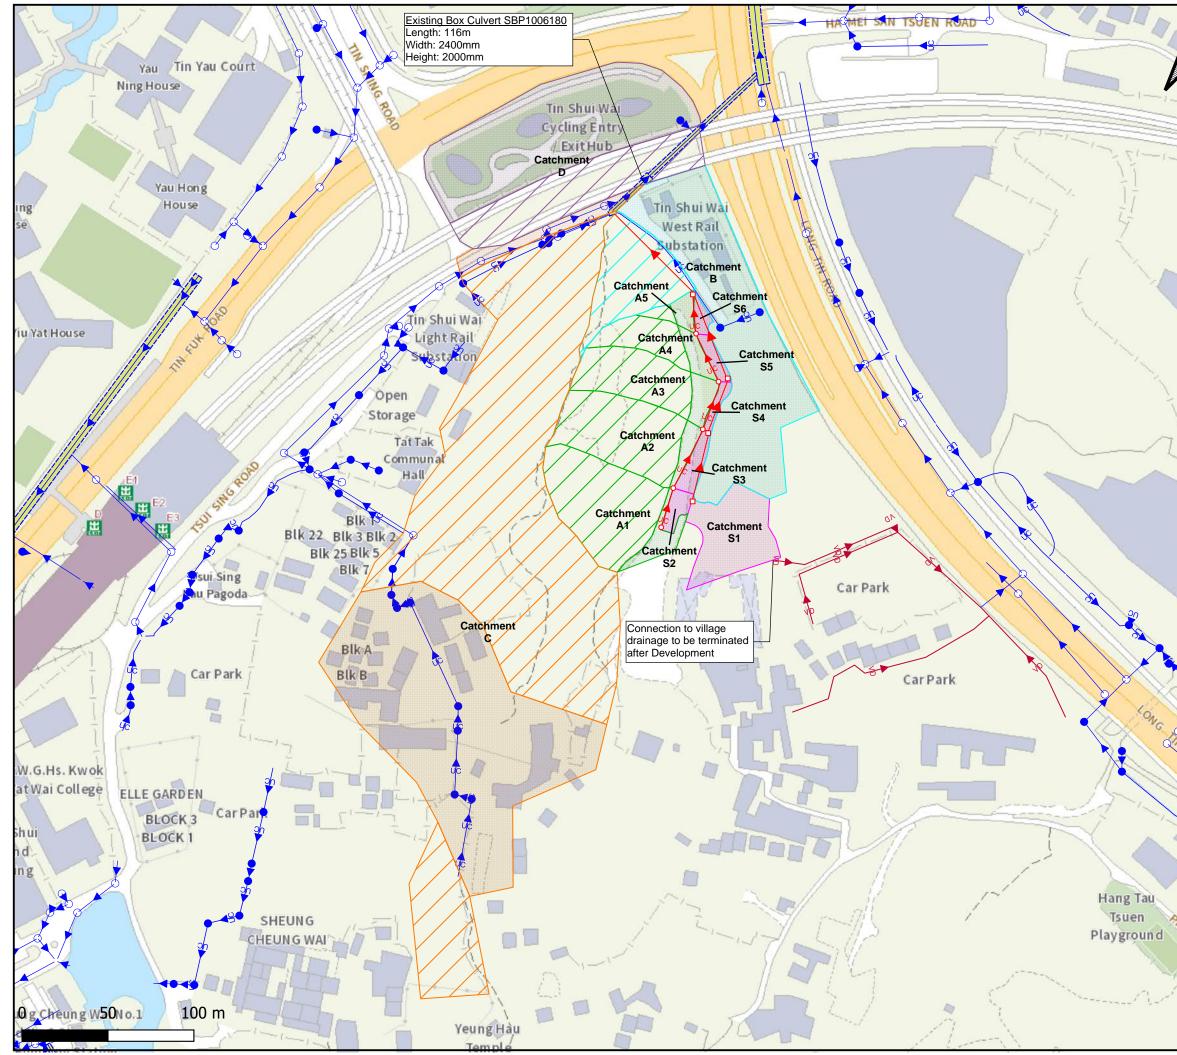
PROPOSED MANHOLES, CATCHPITS AND ITS CONNECTIONS
